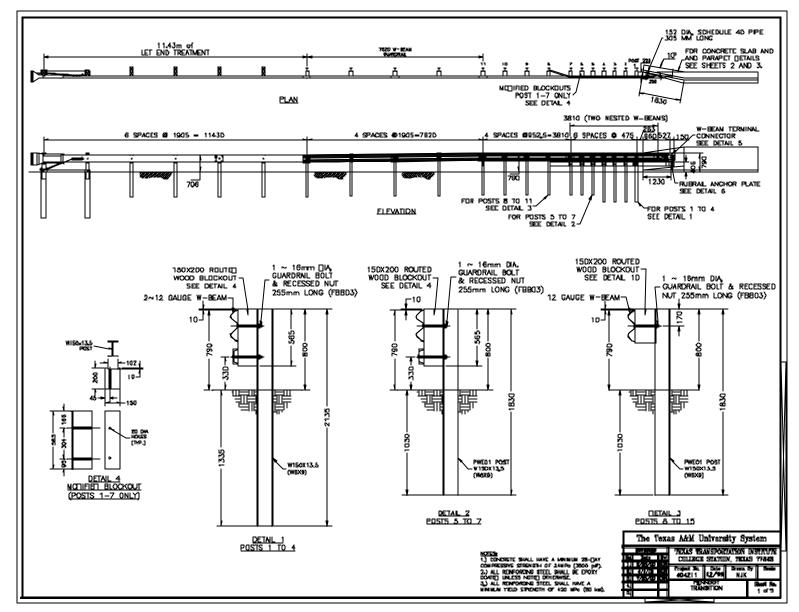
Details of the Pennsylvania transition installation for test 404211-3.
